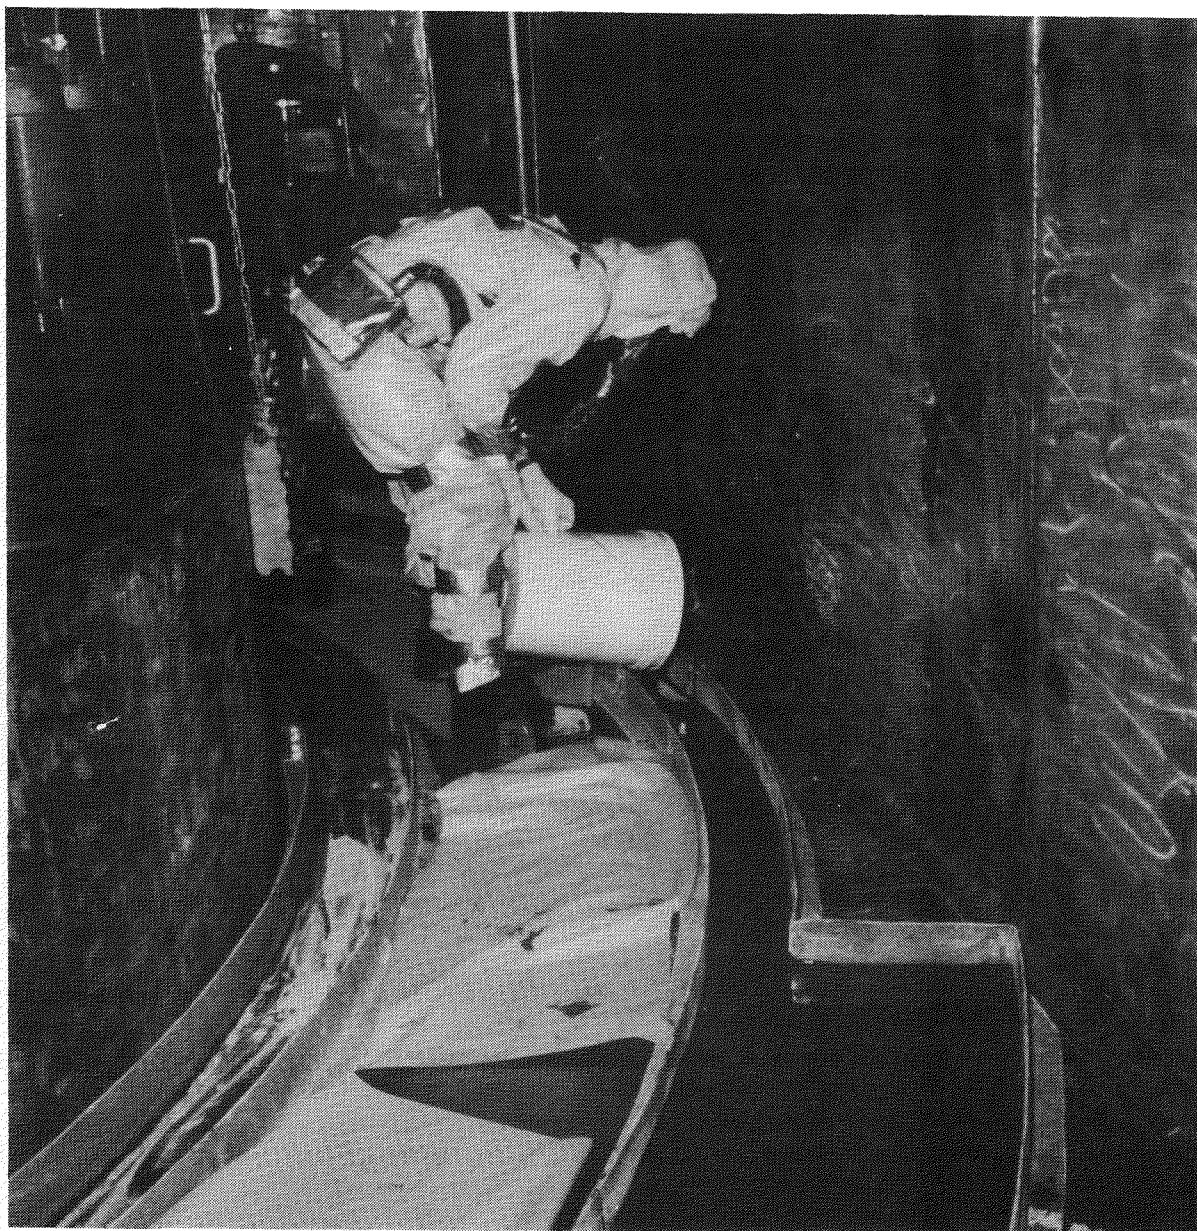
Canal seal plate—pouring sealant in barrier angles.
